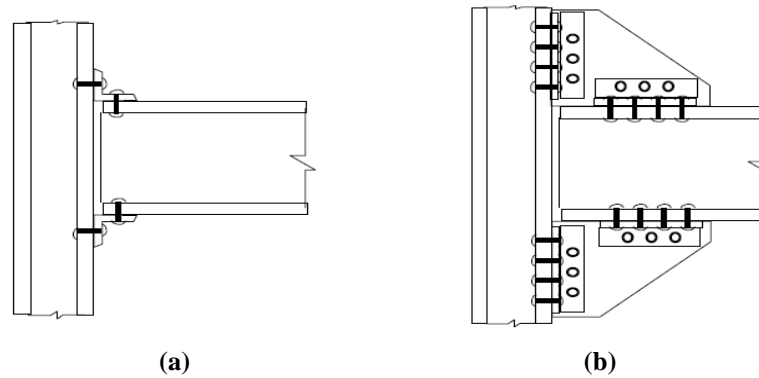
Details of early beam-column connections: (a) pinned connection and (b) rigid connection (FEMA 351, 2000).
